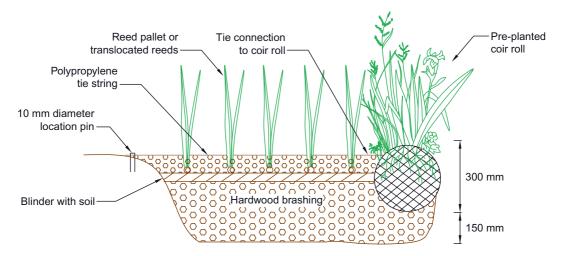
Pre-planted coir roll installed in a pond margin.
